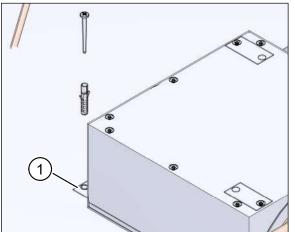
Fixing the sheet steel ceiling box to filigree slab
